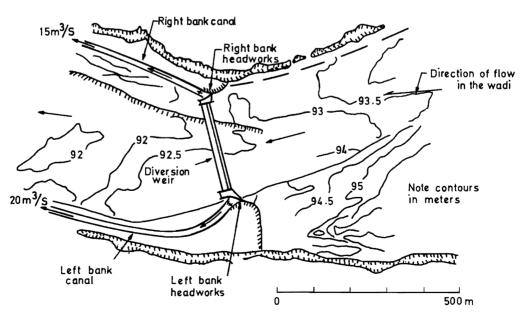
Location Plan for Wadi Dhamad Diversion Weir
